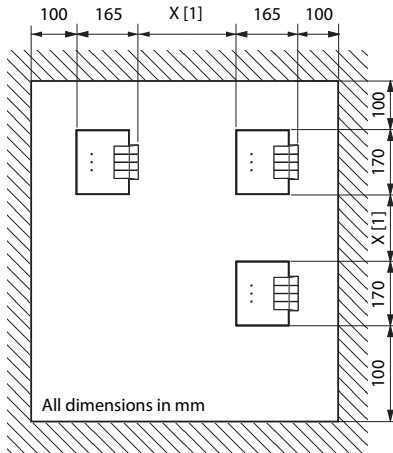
Dimensional drawing for wall-mounting the mounting bracket
